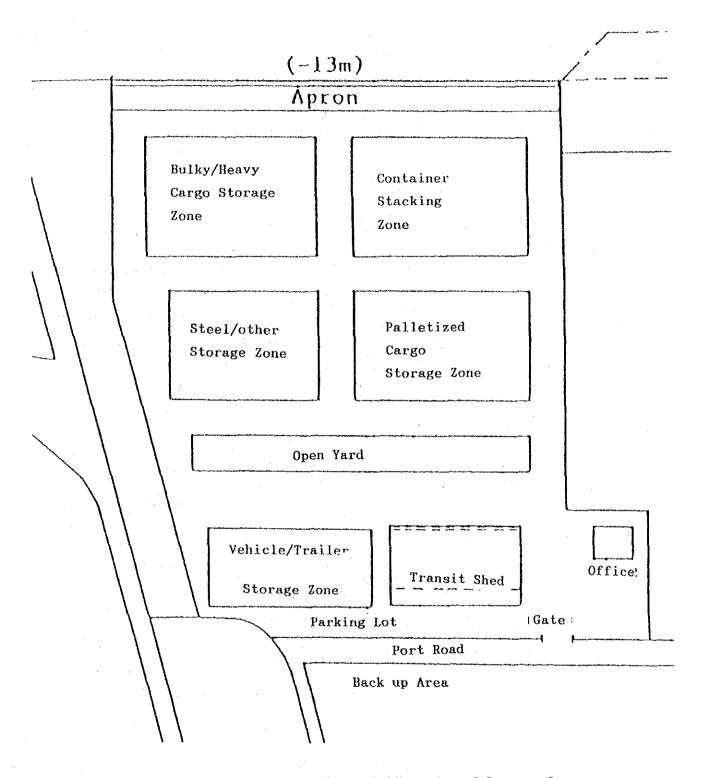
Example Layout Plan of Allocation of Storage Cargo
